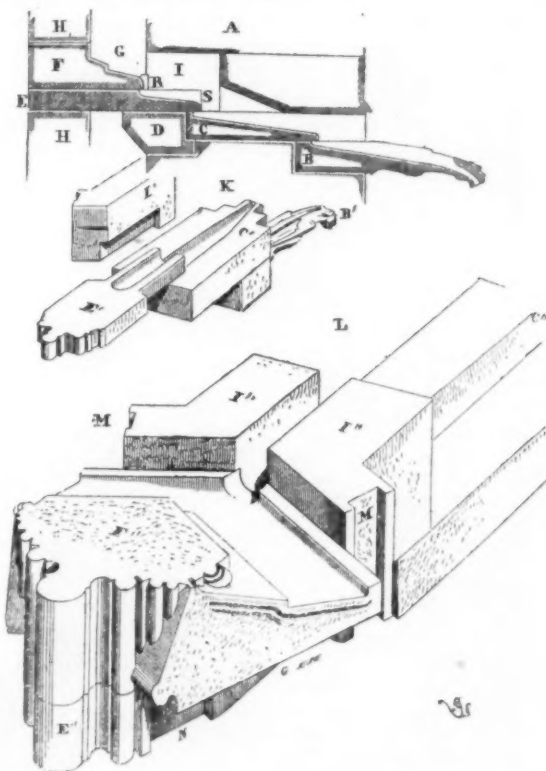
Detail of Pier and Buttress, St. Urbain, Troyes.
